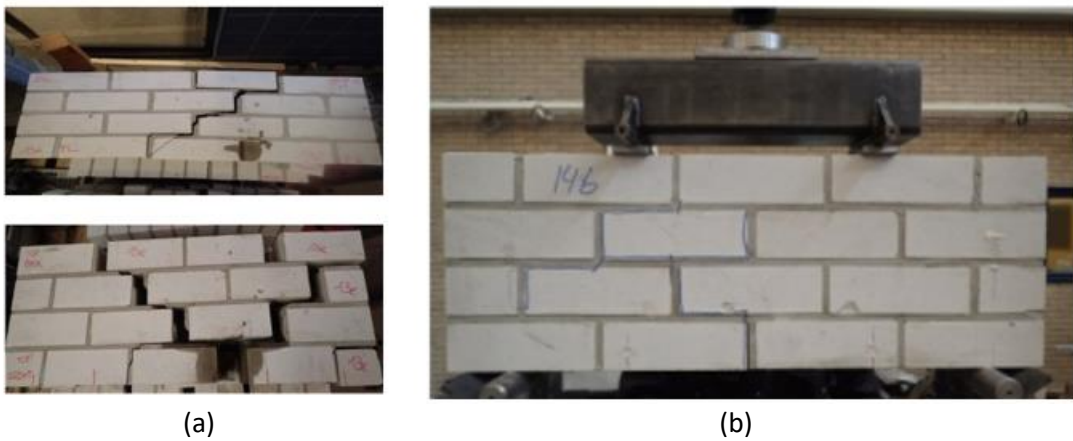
Crack patterns observed in the experiment for (a) OOP bending test with a plane of failure perpendicular to the bed joints (b) in-plane bending test (Esposito et al., 2016)
